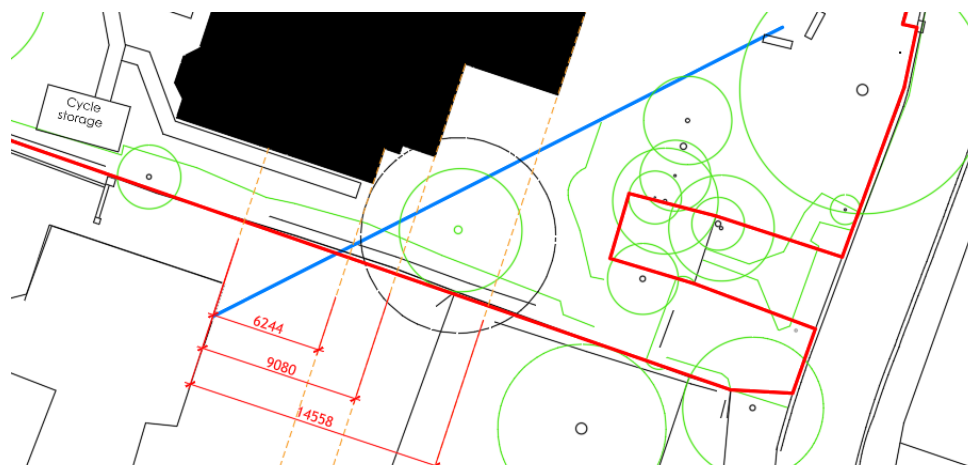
Distances between existing neighbouring building and approved application at 137 Ducks Hill Road
